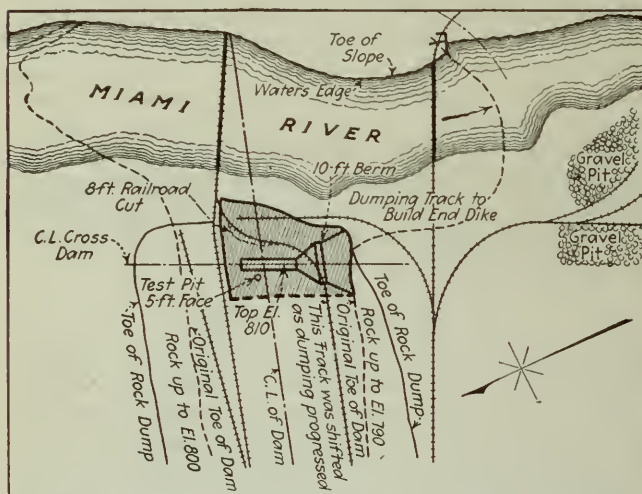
PLAN OF CROSS DAM AND TRACK LAYOUT
